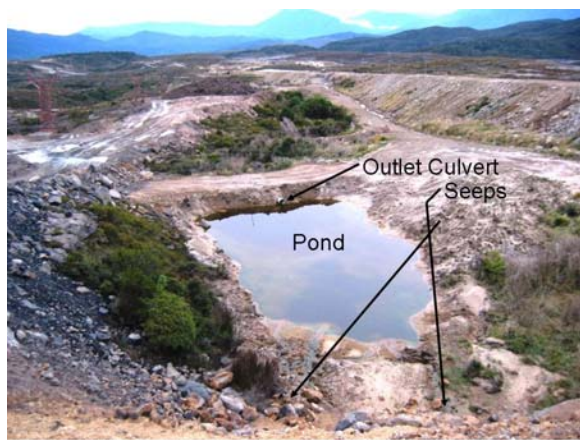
Overview of Manchester Seep and Manchester Pond. Flow exits the pond via the outlet culvert.
